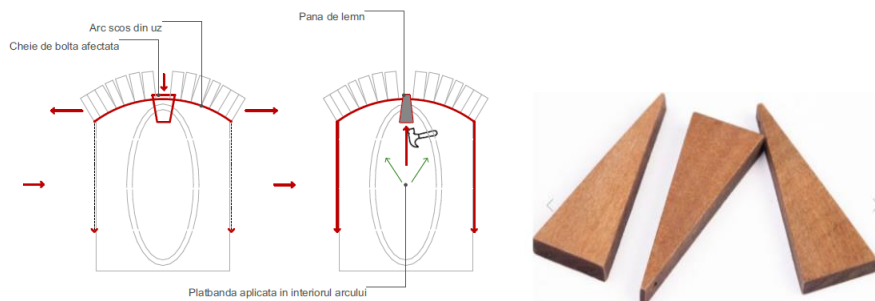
Interventions at the masonry arches and vaults with wood panels beaten from bottom to top.
